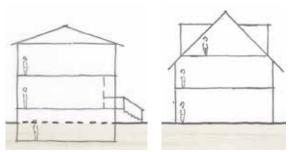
Examples of different ways to achieve a 2.5 storey building (See policy 8.13.9).
